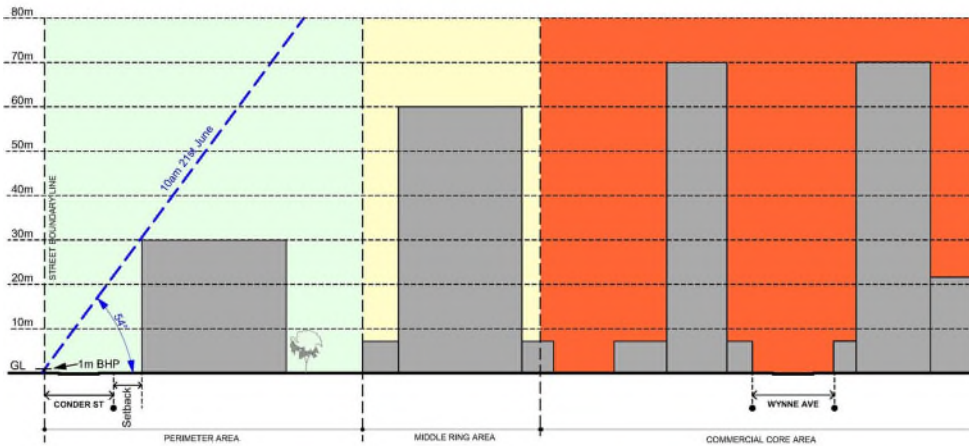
Building Height Plane Diagram Showing the Location of Section Plans
